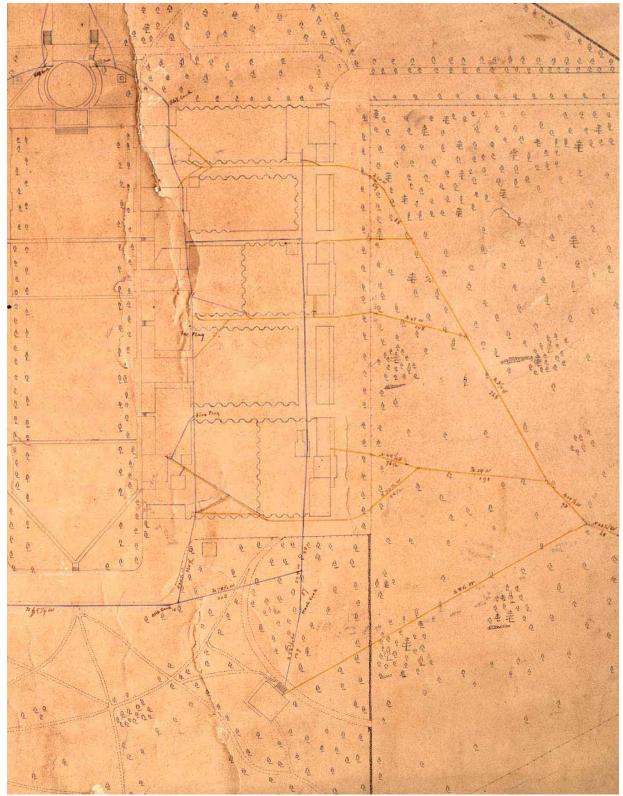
This detail of the Lawn and East Range shows a system of extended sewerage lines draining to the valley east of the Academical Village. (R-JAV-SLC-MP-c1875-RG31-1-2_2.791-M-0-Anon_detail.jpg).
